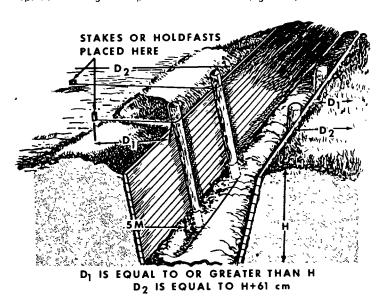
Method of anchoring retaining wall posts/pickets.
